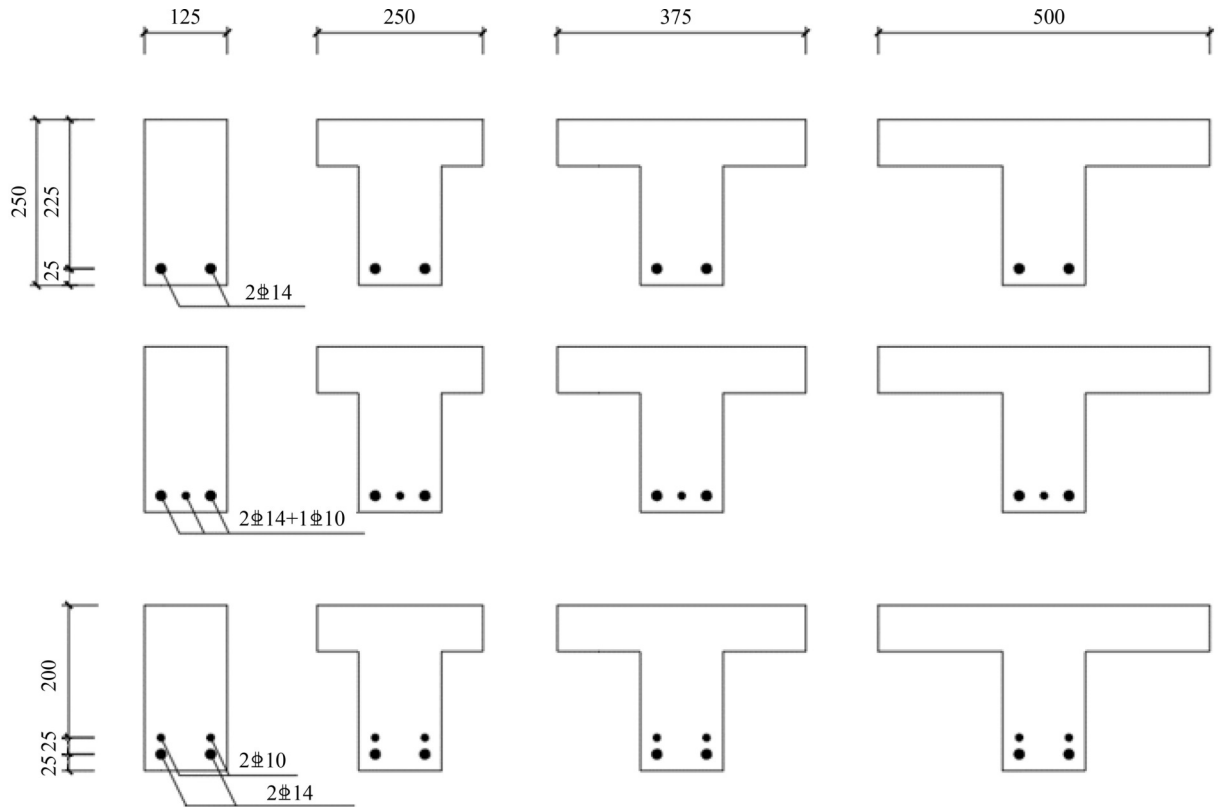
Reinforcement layout of specimen (where the first row is reinforcement form 1, the second row is reinforcement form 2, and the third row is reinforcement form 3).
